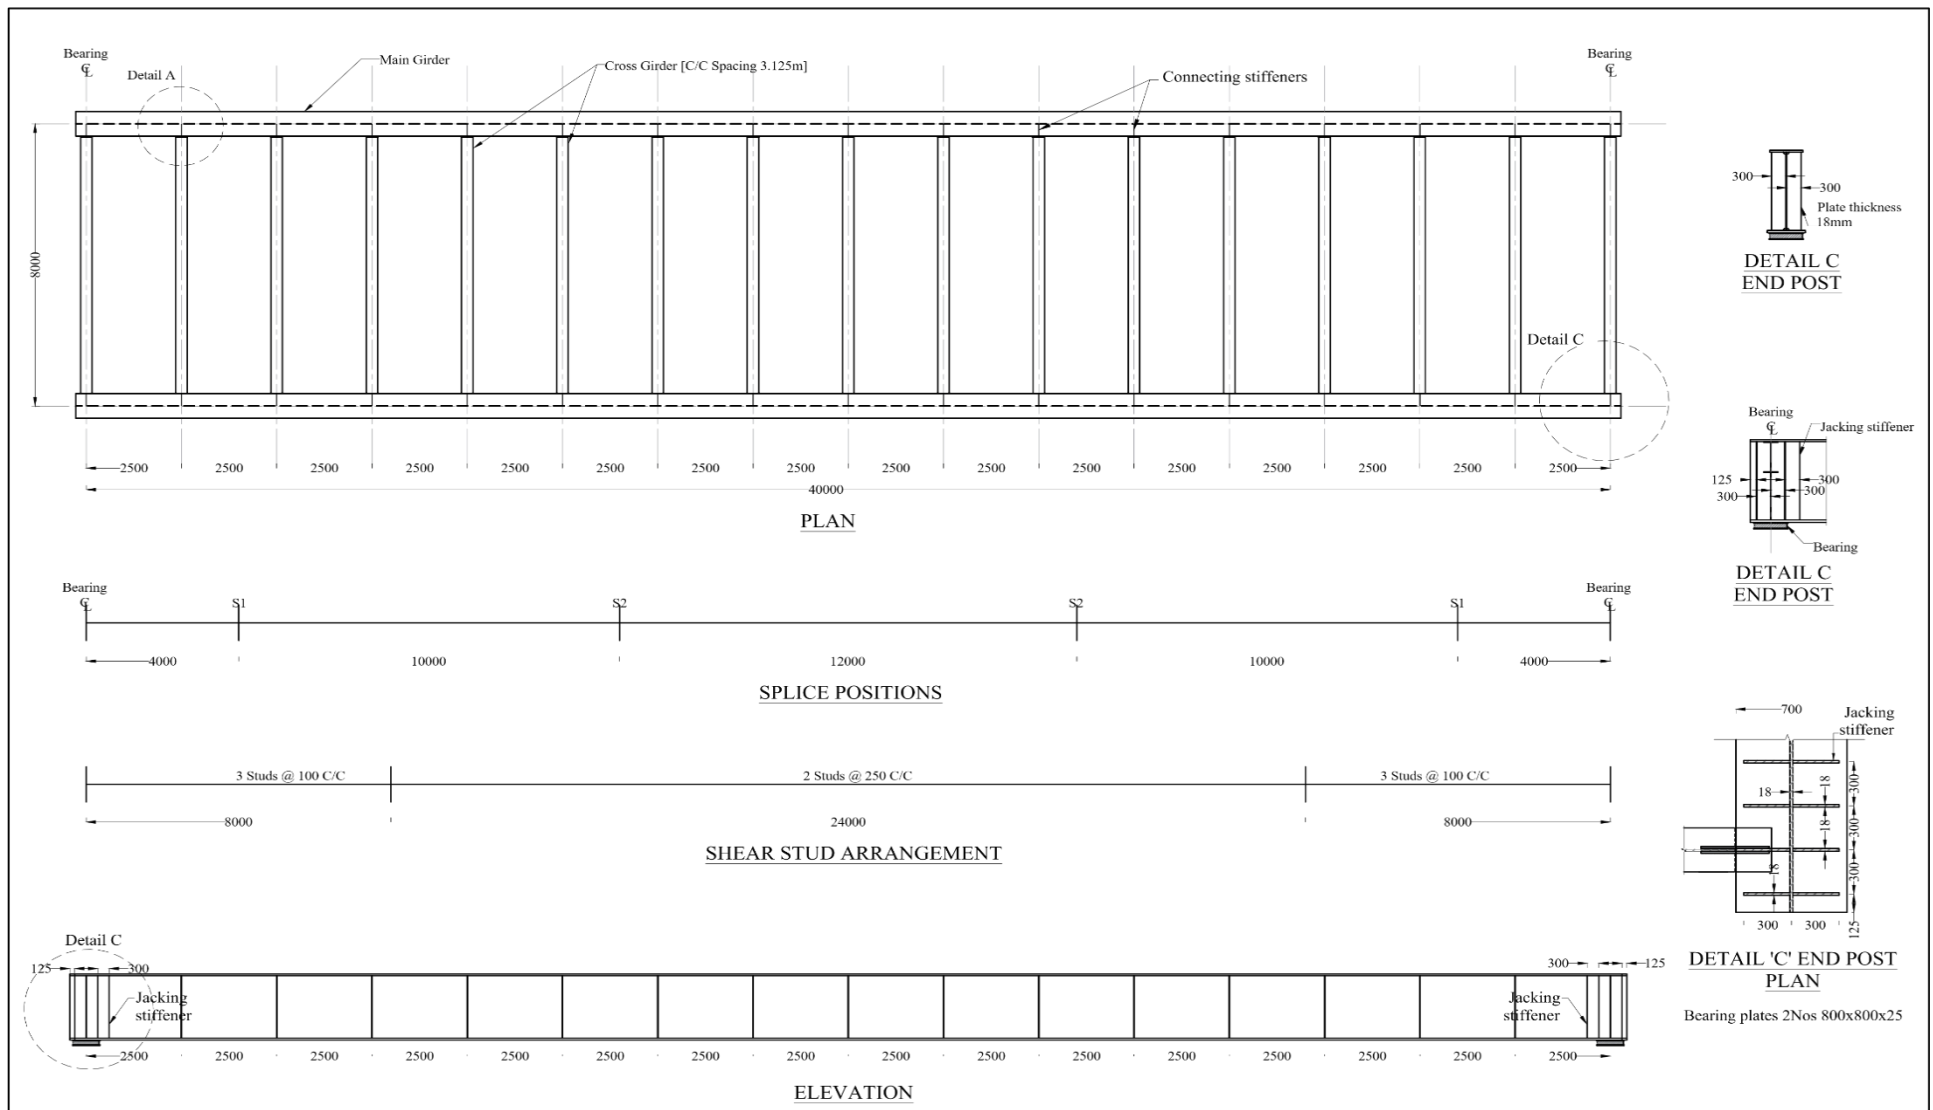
8 STEEL CONCRETE COMPOSITE LADDER DECK SPAN 40m
